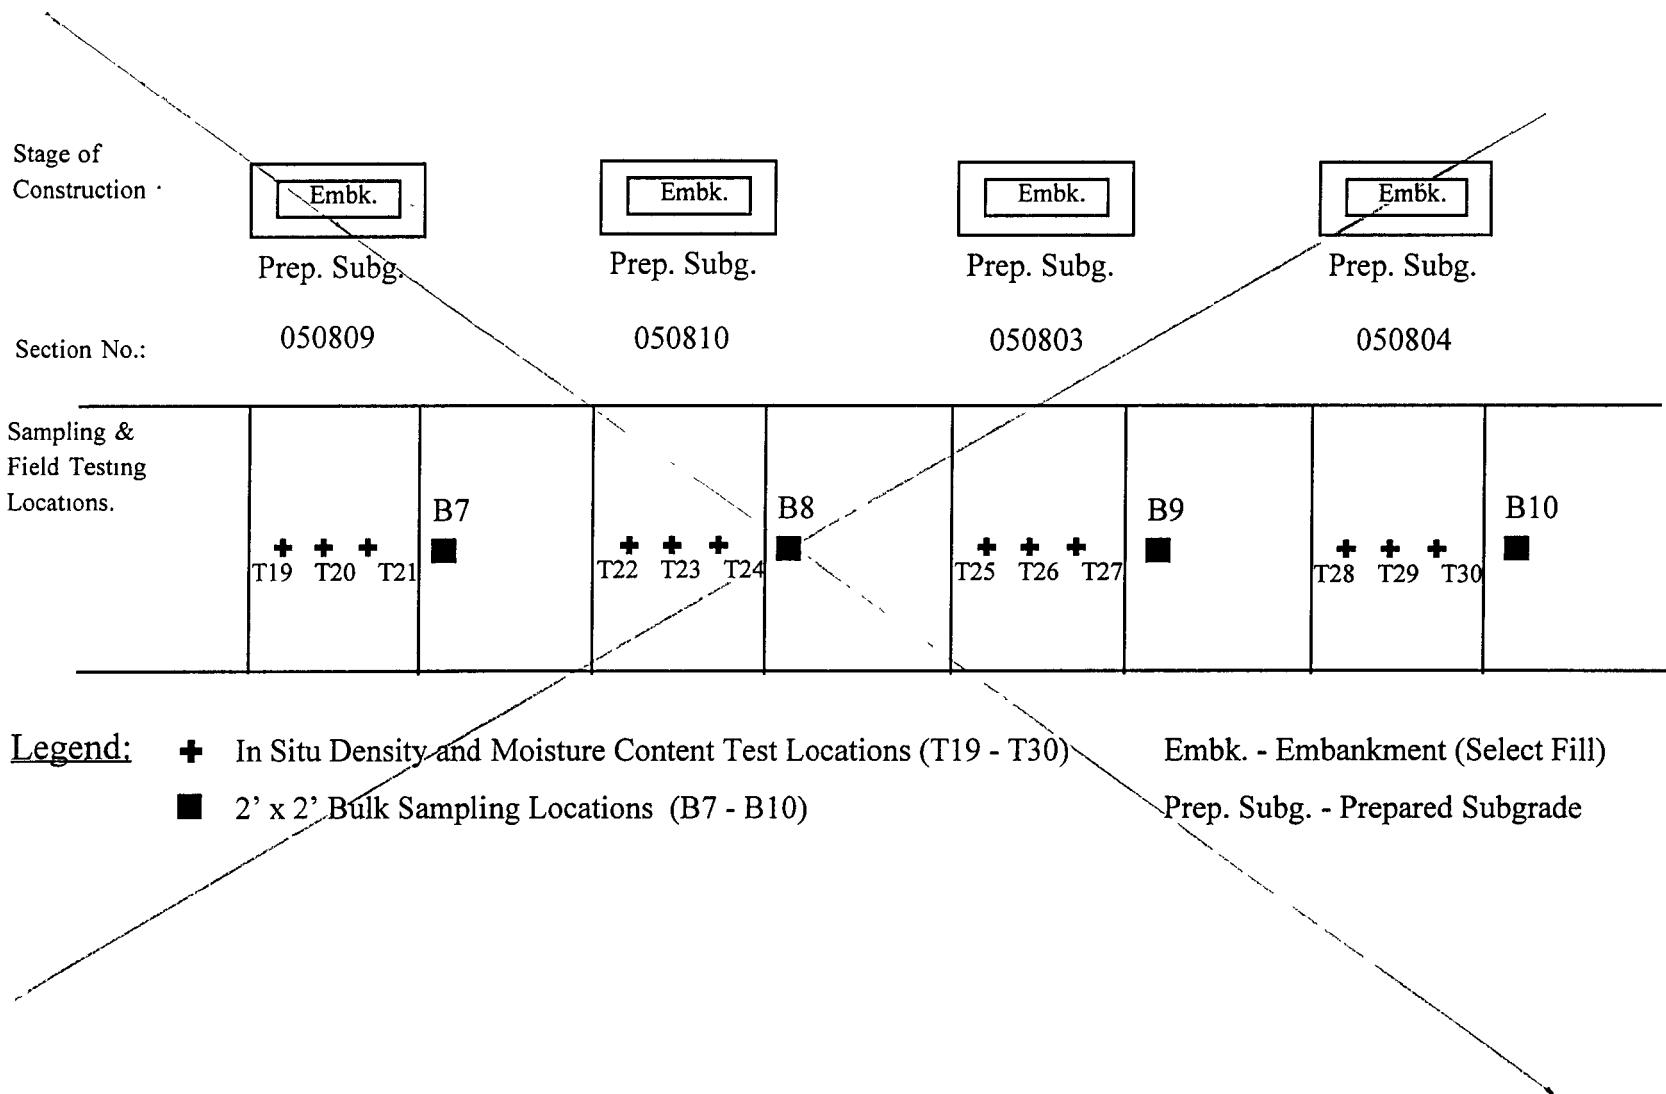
SITE LAYOUT WITH SAMPLING AREAS
